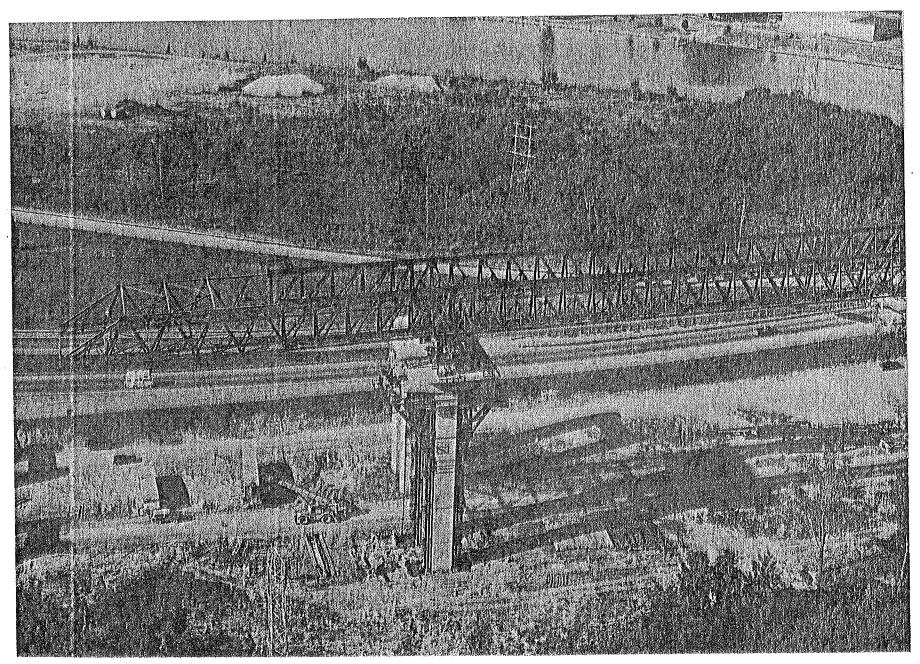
Aerial view of Launching Girder at Pier 9N
